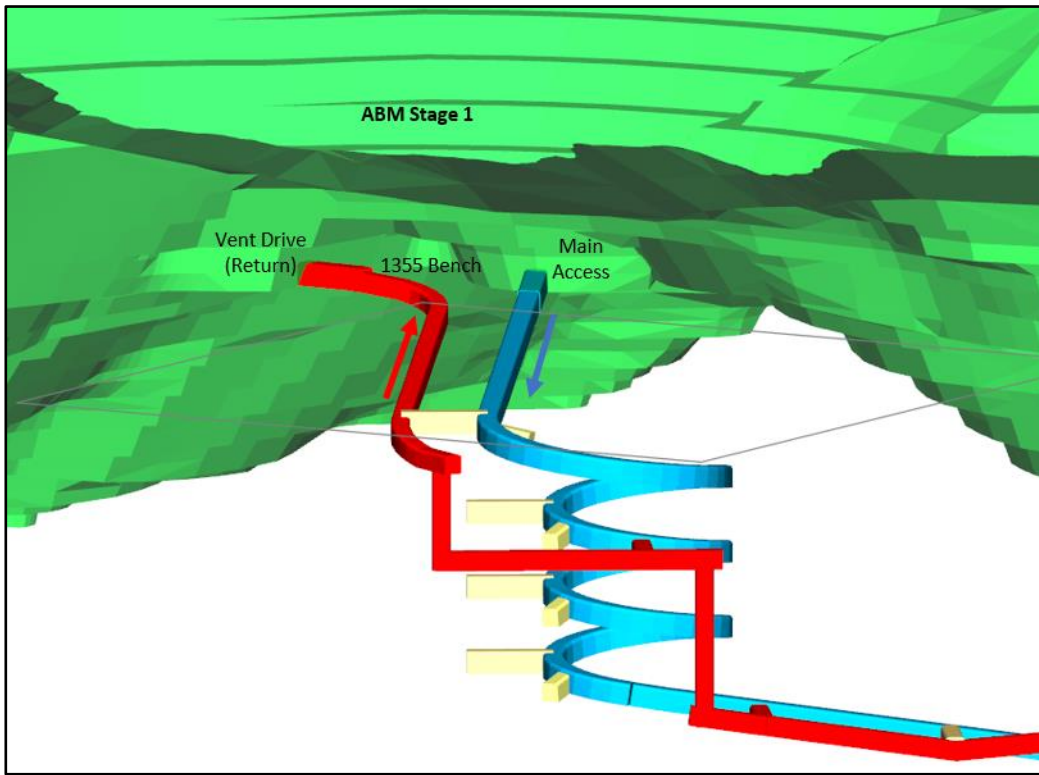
Main access and ventilation ramp, viewed looking northeast
